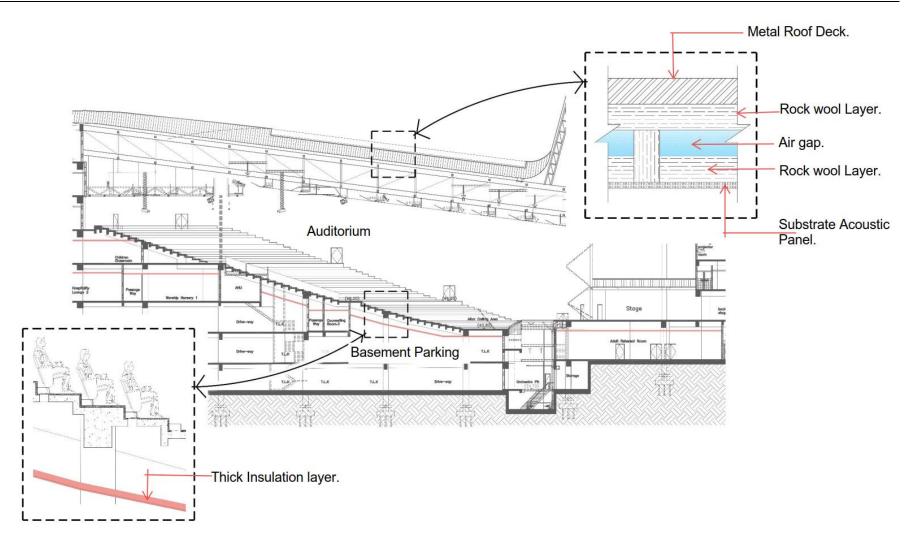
Calvary Church: Roof & Floor Sound Insulation.
